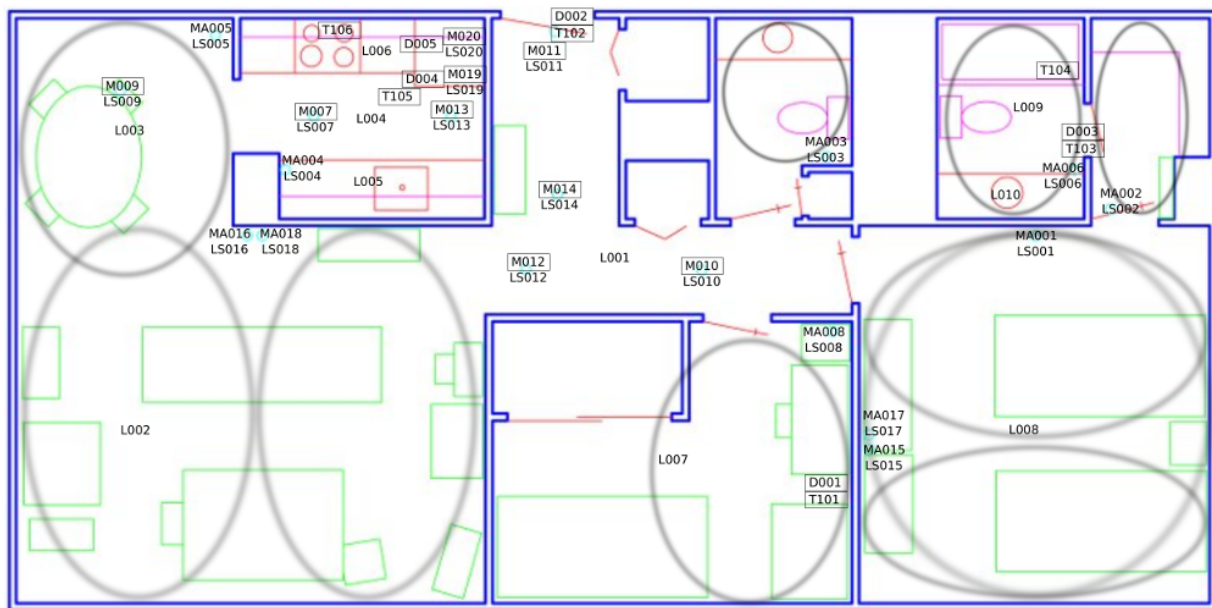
Floor plan and sensor placement for the testbed hh118.
